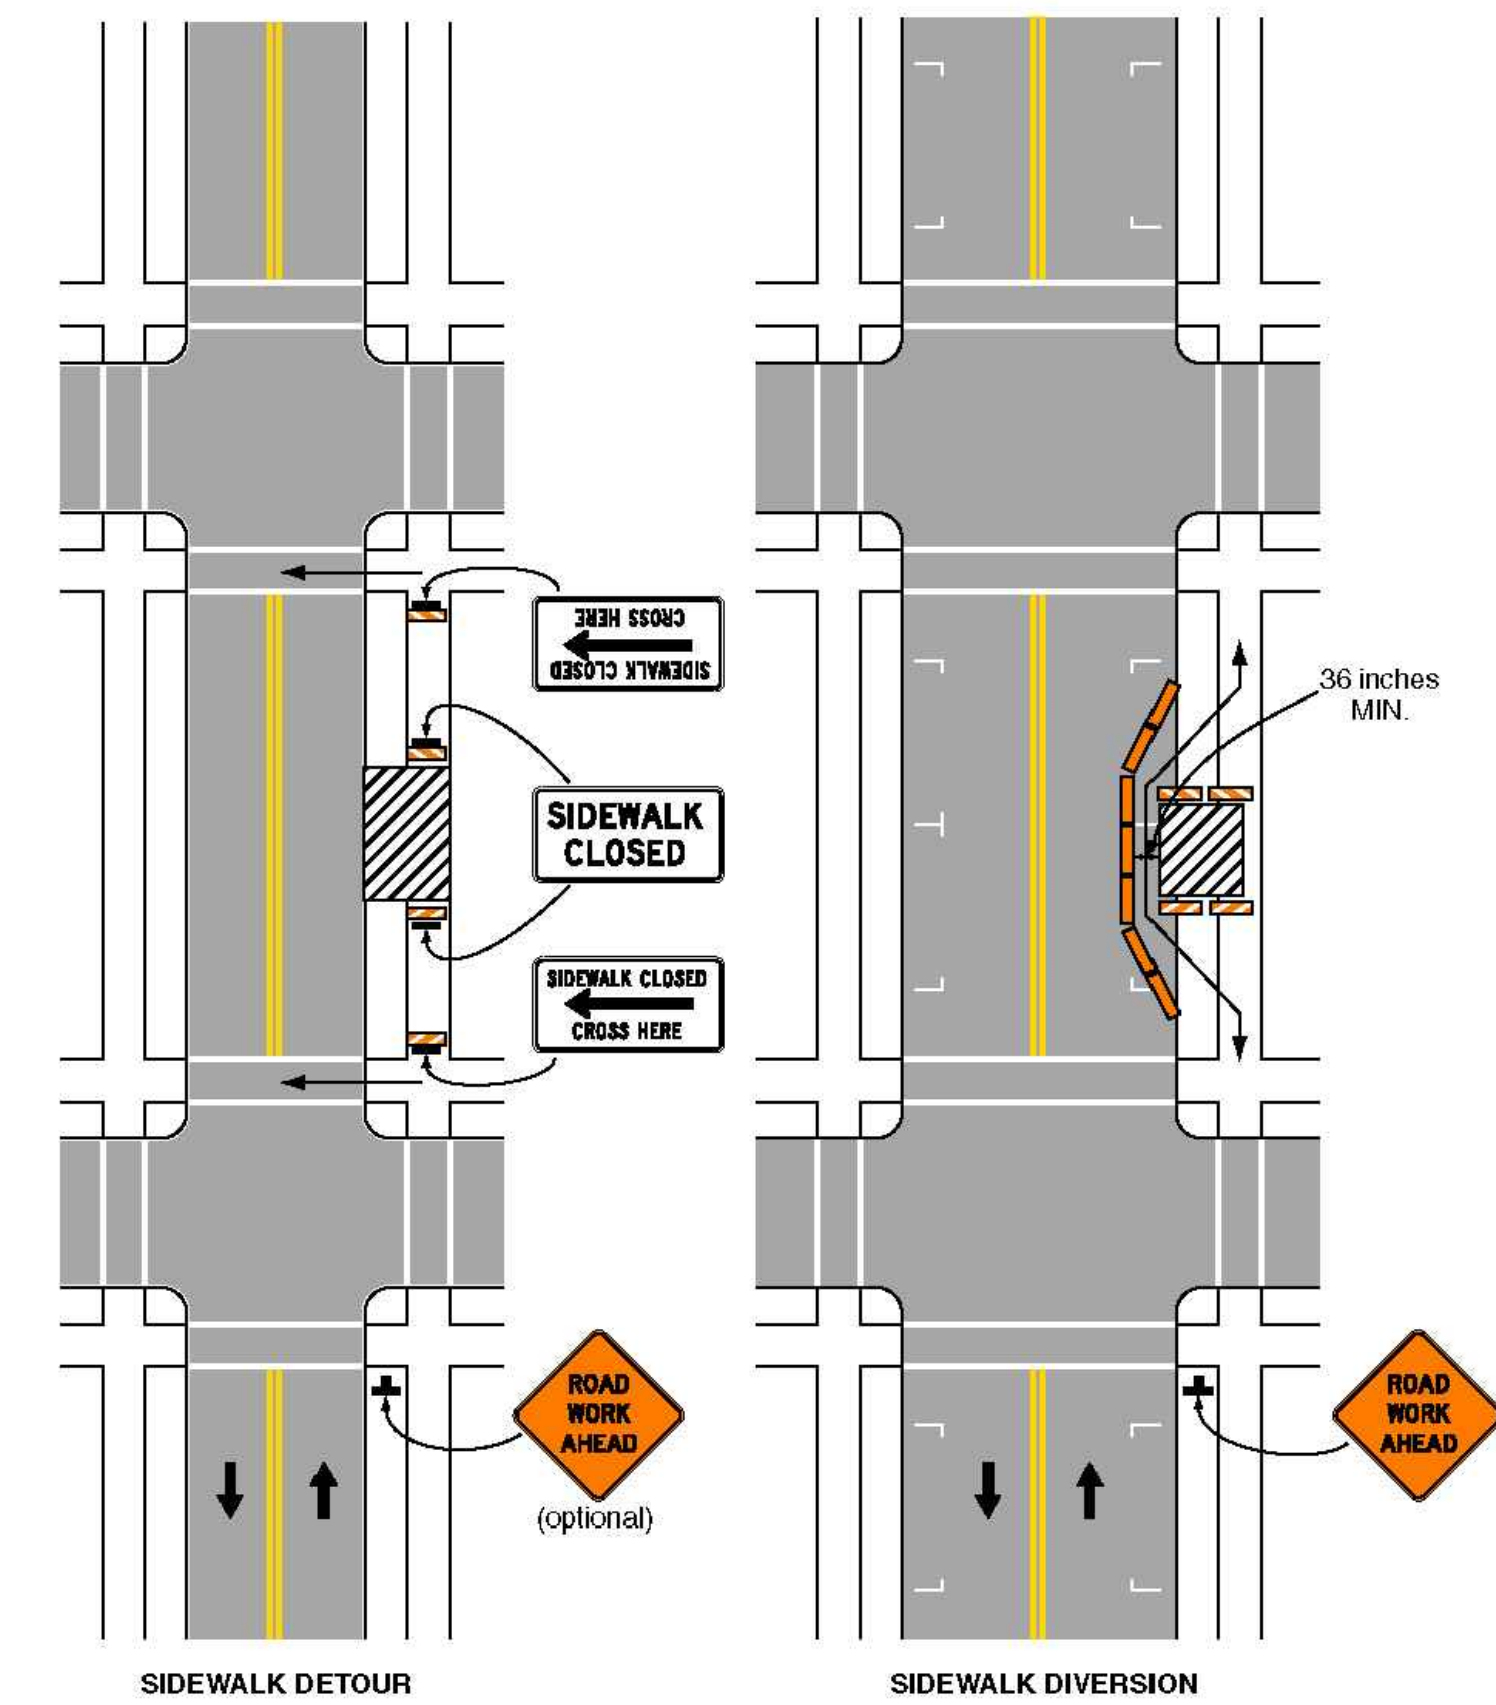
H-28. Sidewalk Detour or Diversion (TA-28)
